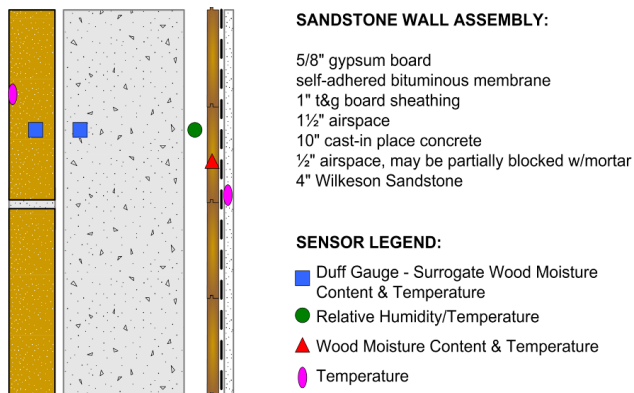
Existing Sandstone Wall Assembly and Installed Sensors
